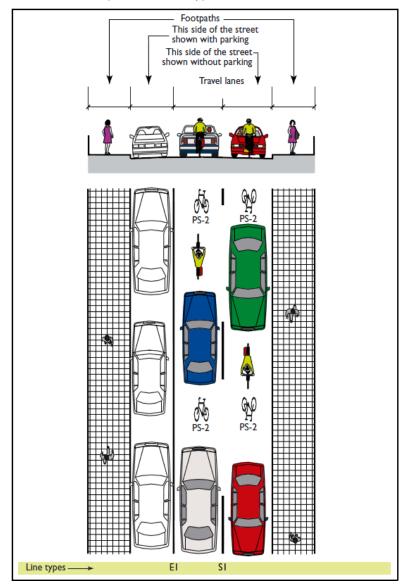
Typical Plan and Cross-Section for On-Road Mixed Traffic Bicycle Routes
